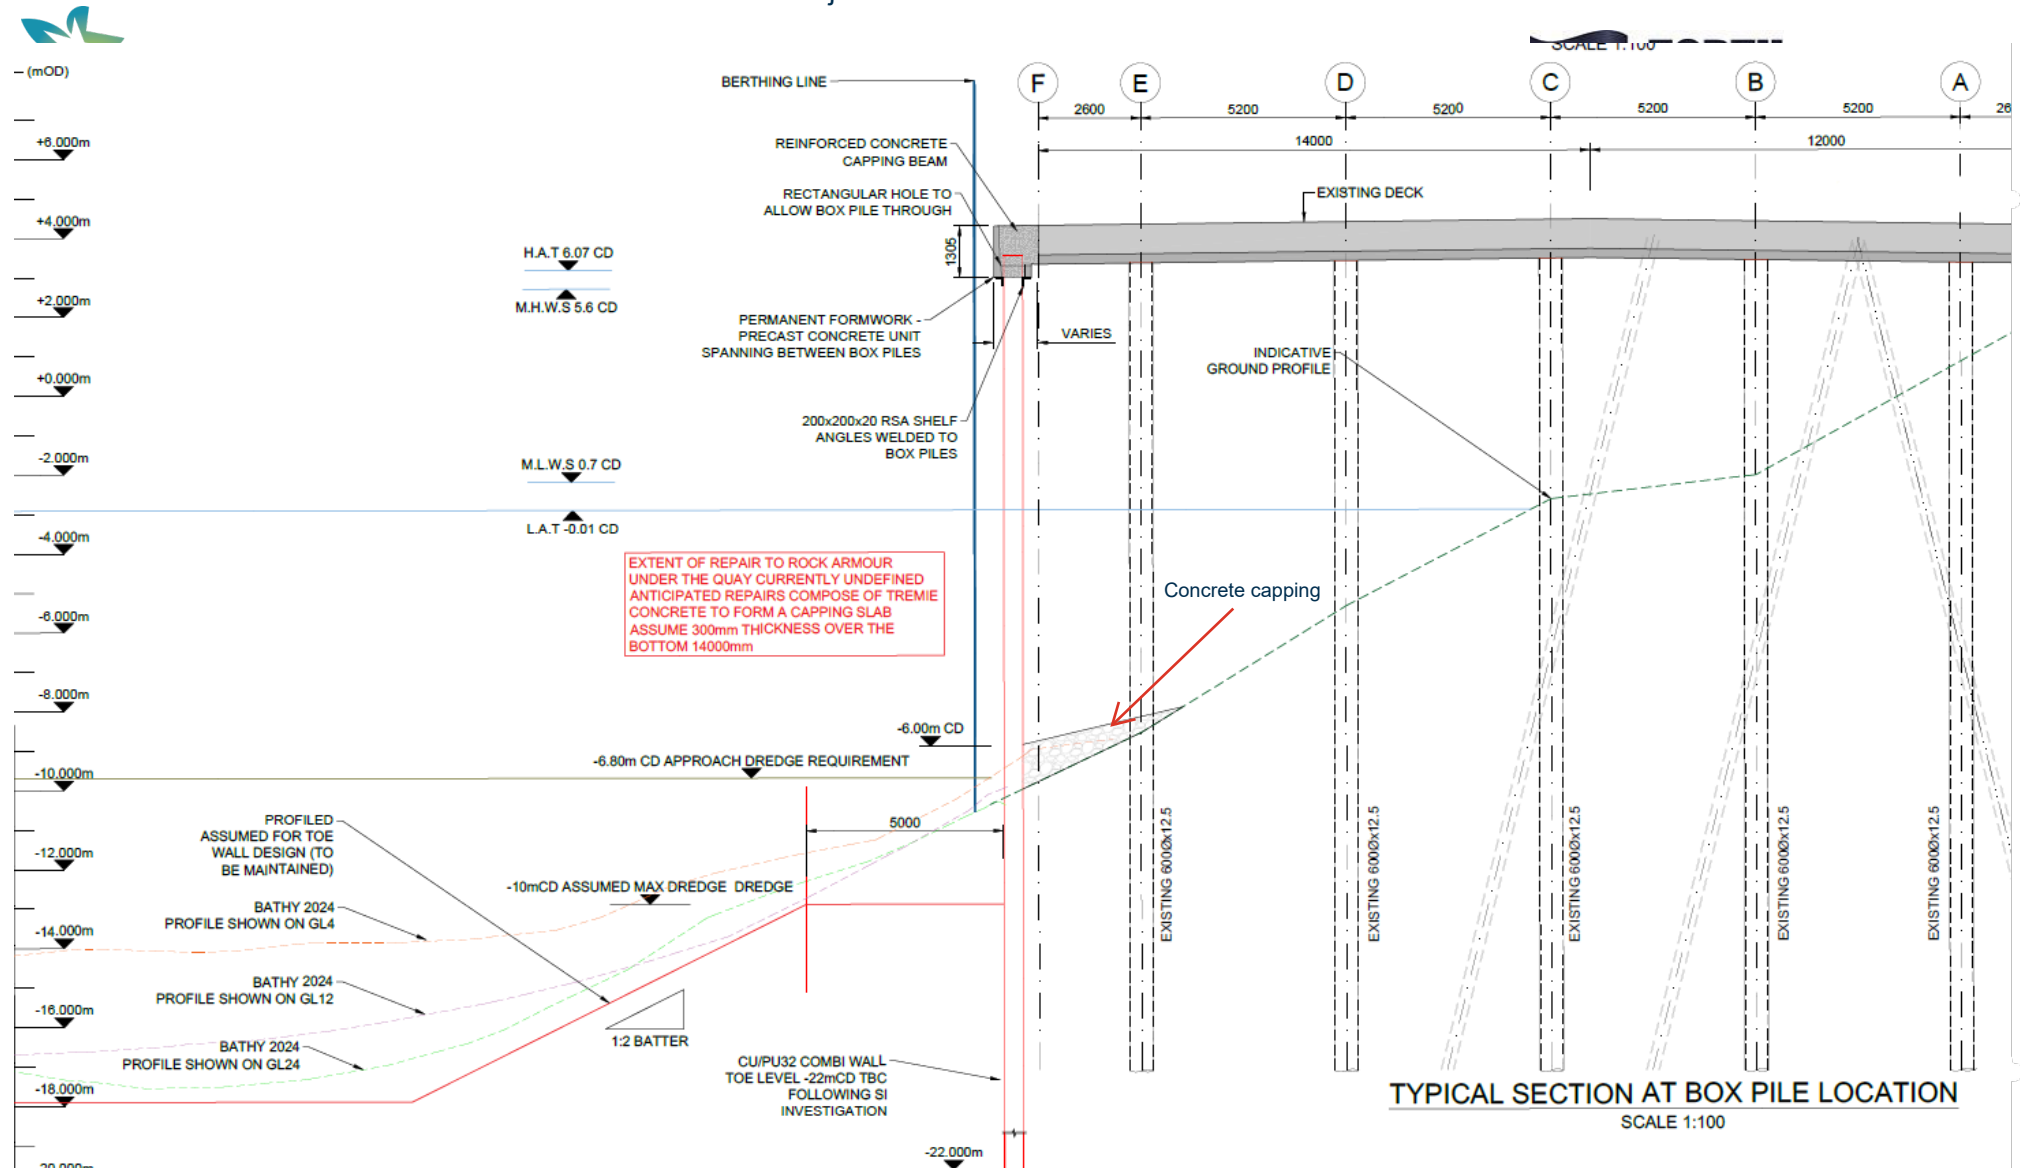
Typical cross section of the improvement works to the PCW (proposed new pile shown in red)
